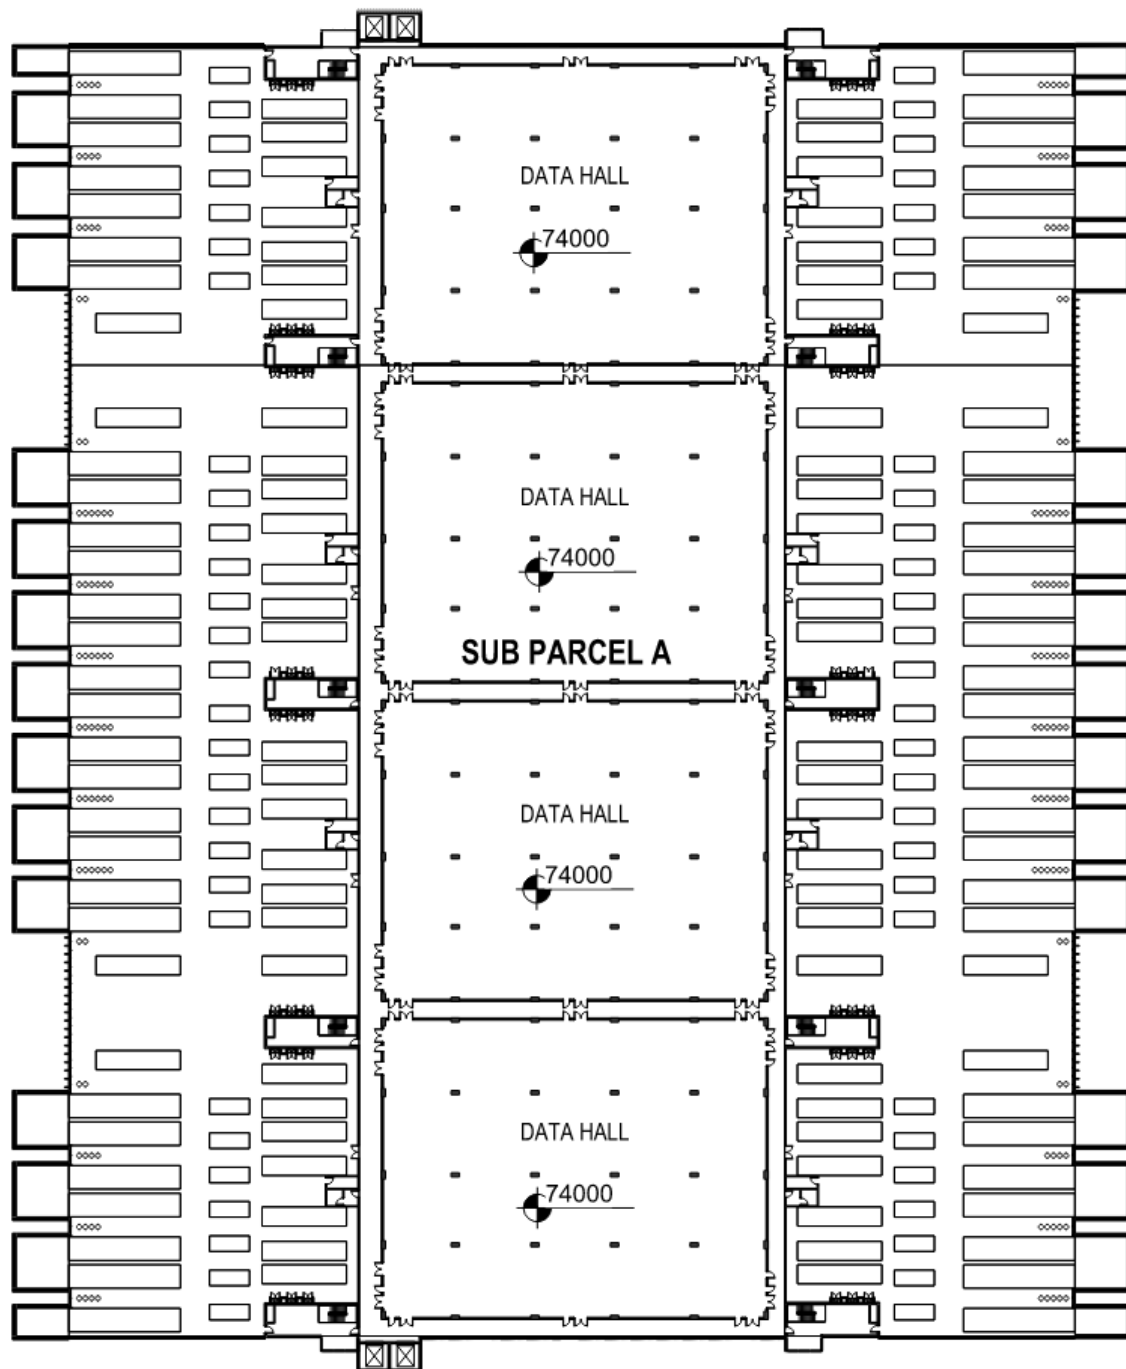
Level 3 Layout of Data Hall Building – Typical per Sub Parcel
